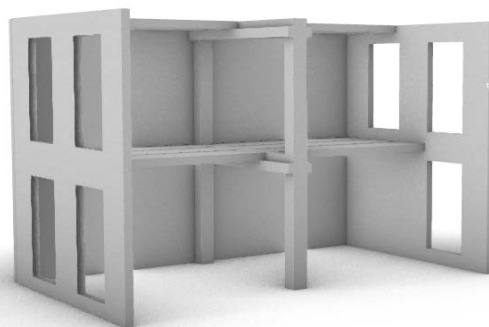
Visualization of the precast concrete building system considered in this thesis.
